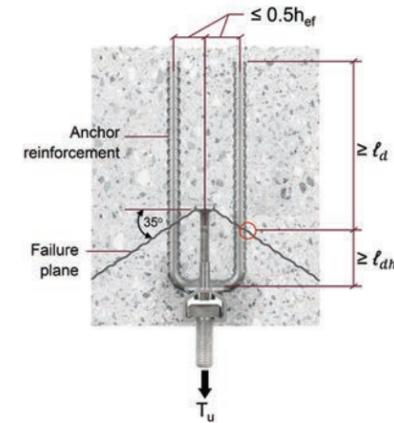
Arrangement of anchor reinforcement for anchor channels loaded by tension load in a narrow member.
